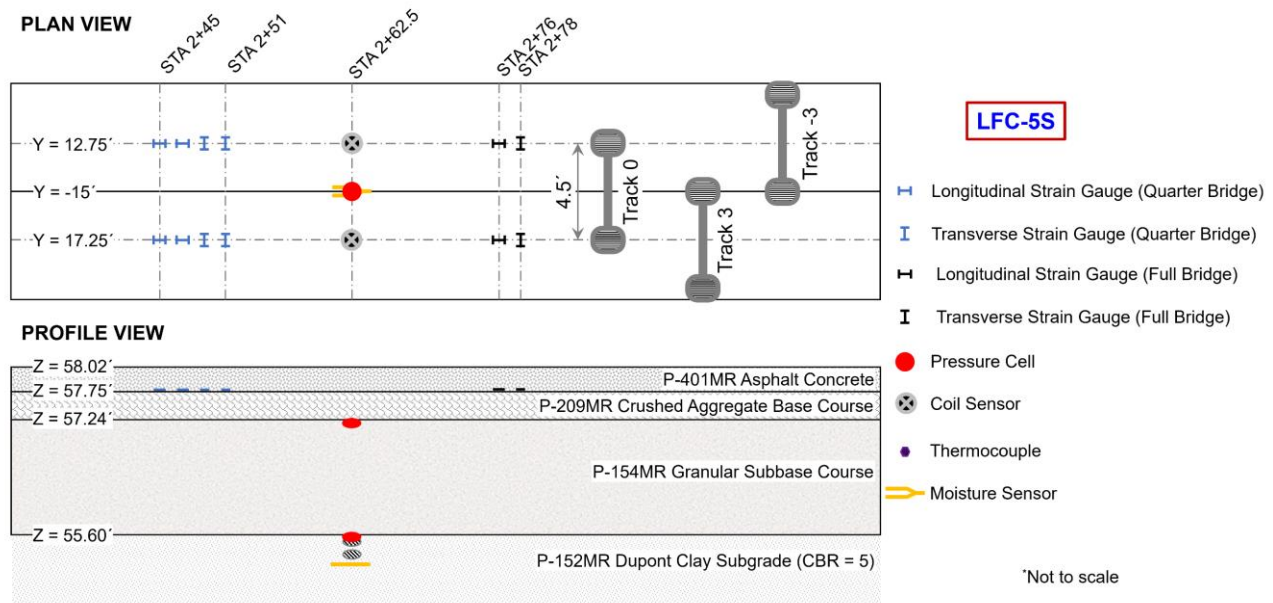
Layout of Instrumentation in Overload Test Item LFC-5S
